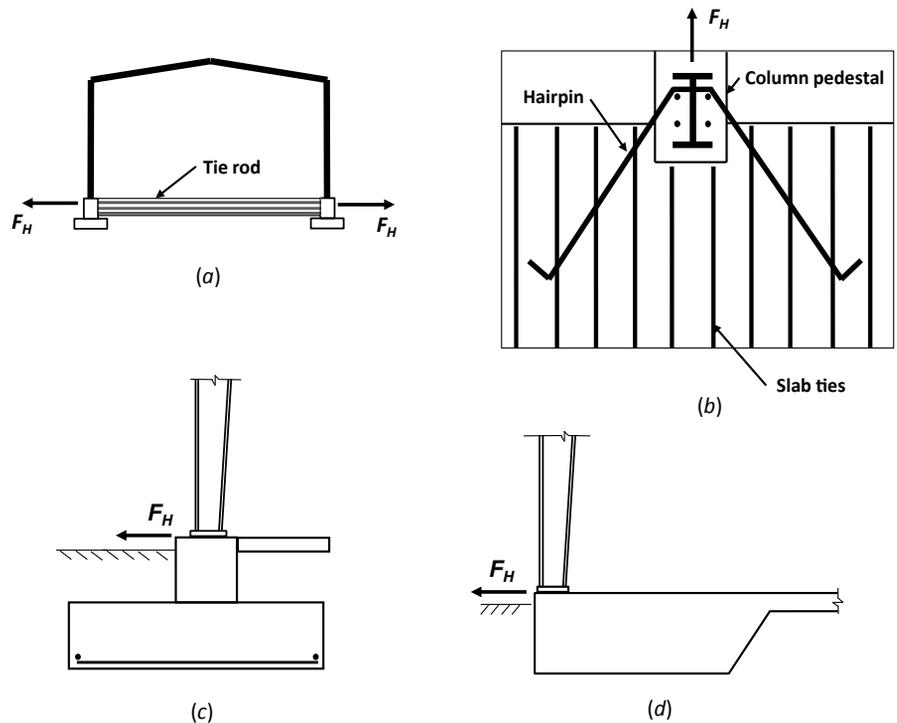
Common Foundations Used in Metal Building Systems: a) Tie rod; b) Hairpins with slab ties; c) Moment-resisting foundation; d) Slab with haunch.
